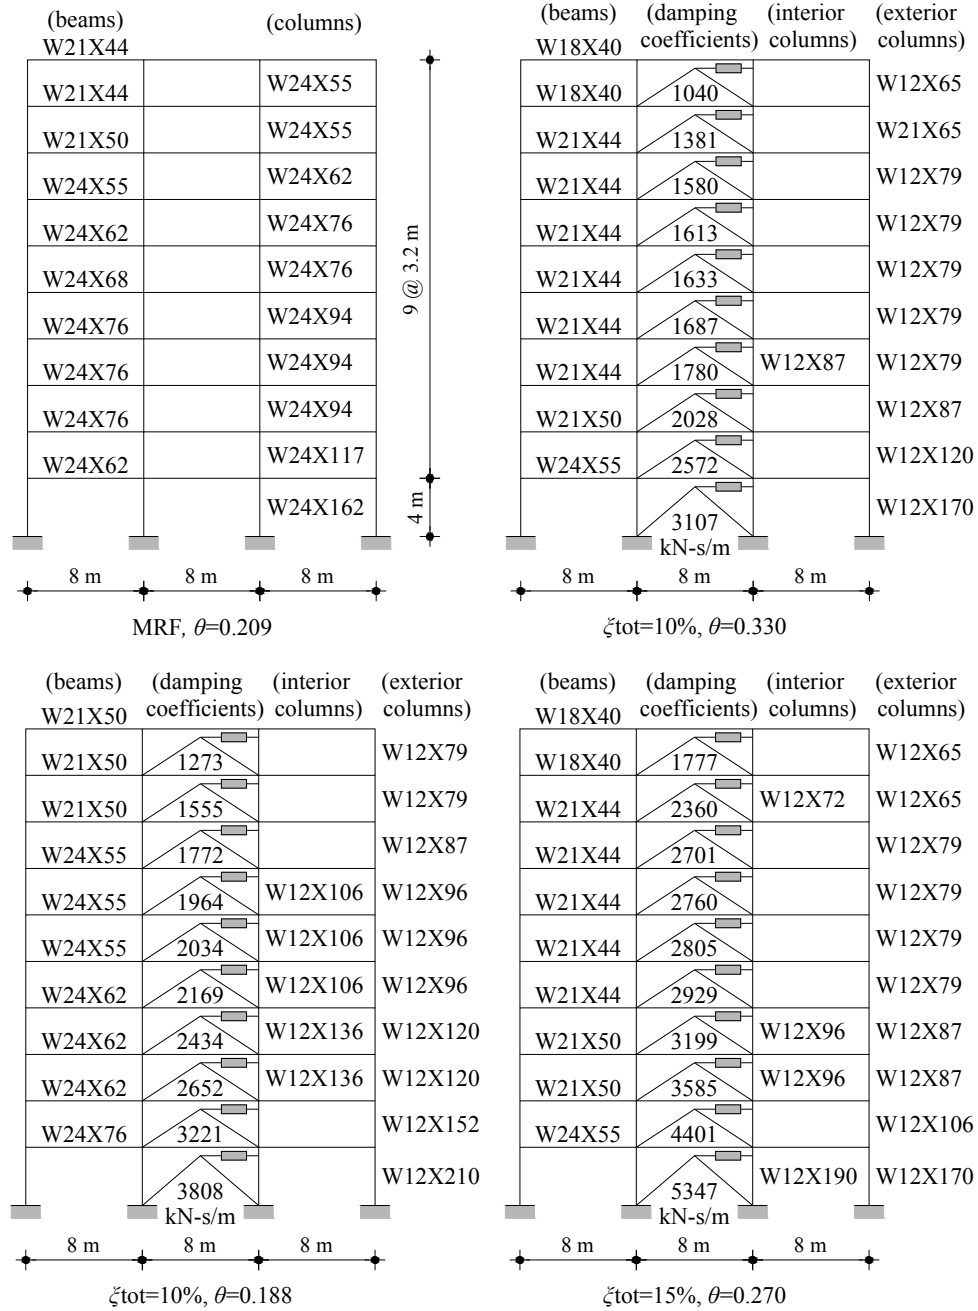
Elevation view and beam/column cross-sections of the 10-storey steel MRF and the MRFs with viscous dampers. The damping coefficients of the viscous dampers are also provided. The interior column cross-sections of the MRFs with viscous dampers are the same with the exterior apart from the indicated
